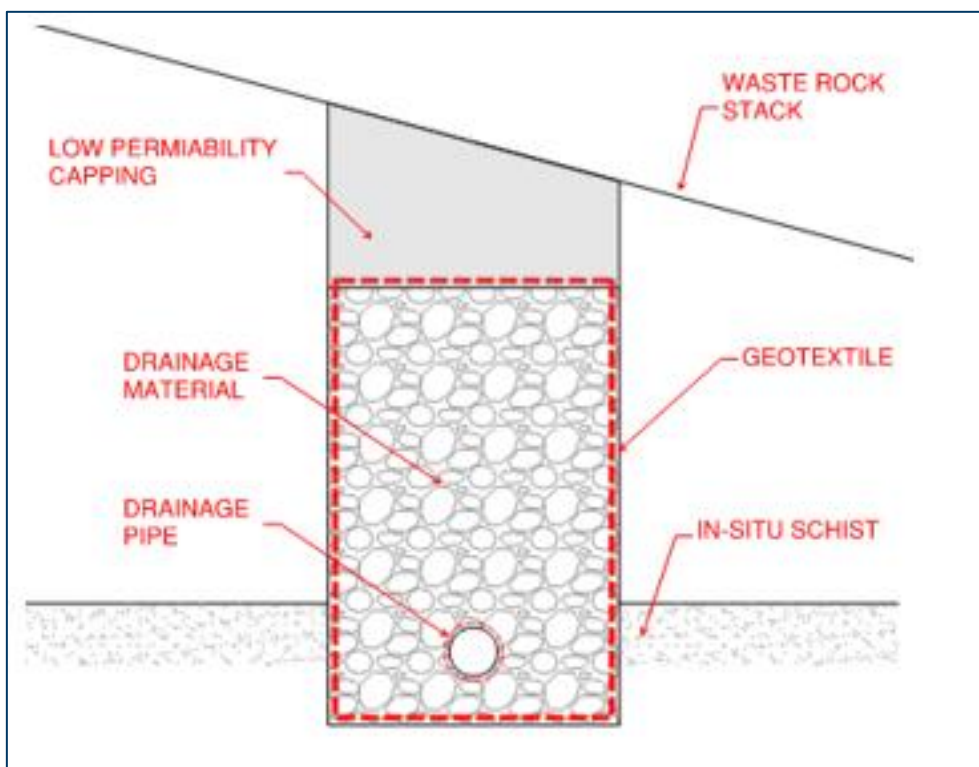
Typical cross section of engineered seepage drain trench.
